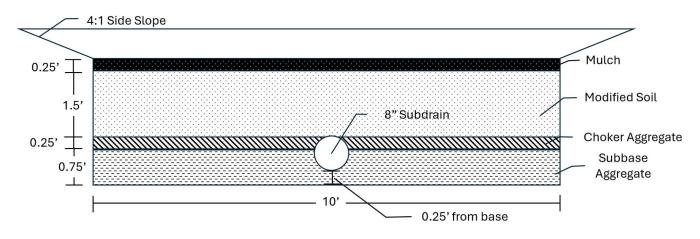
Cross-section of a typical bioretention cell with various layers for infiltration and storage.
